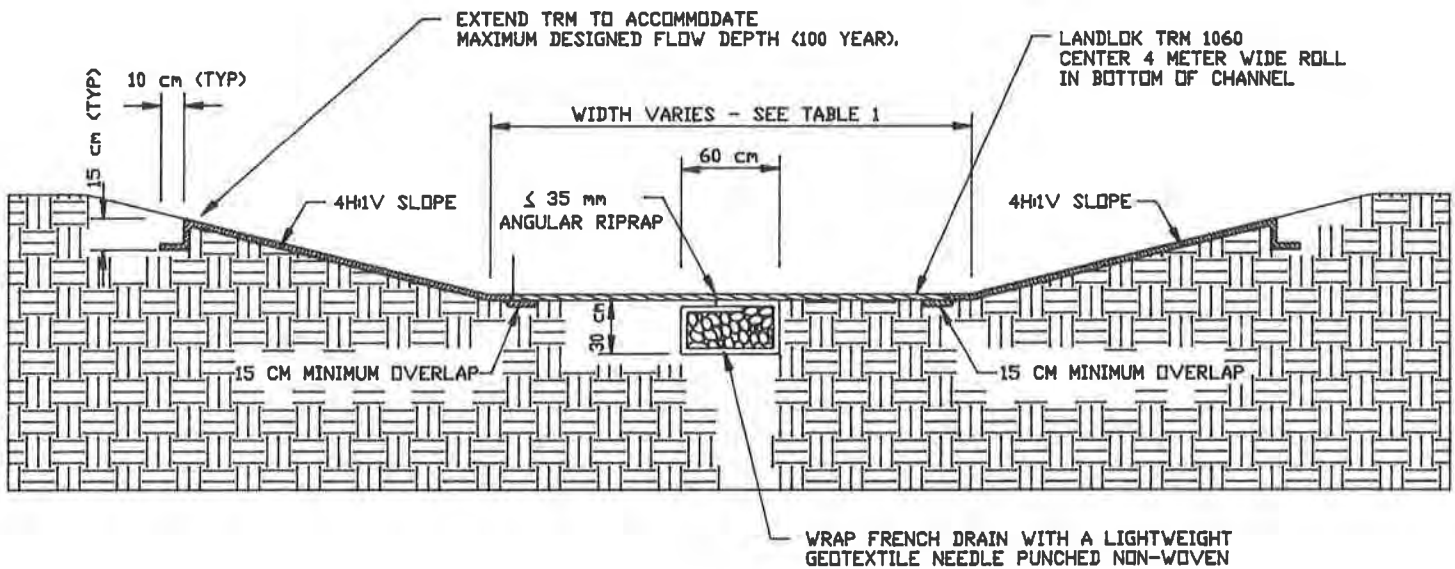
Cross-section of geotextile-wrapped trench drain to control perched water table.
